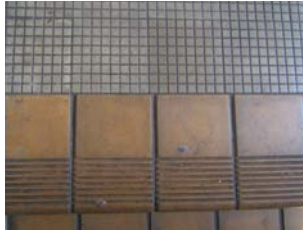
In the communal stairwell clay tiles on the stairs are contained with terrazzo tiles on the landings
